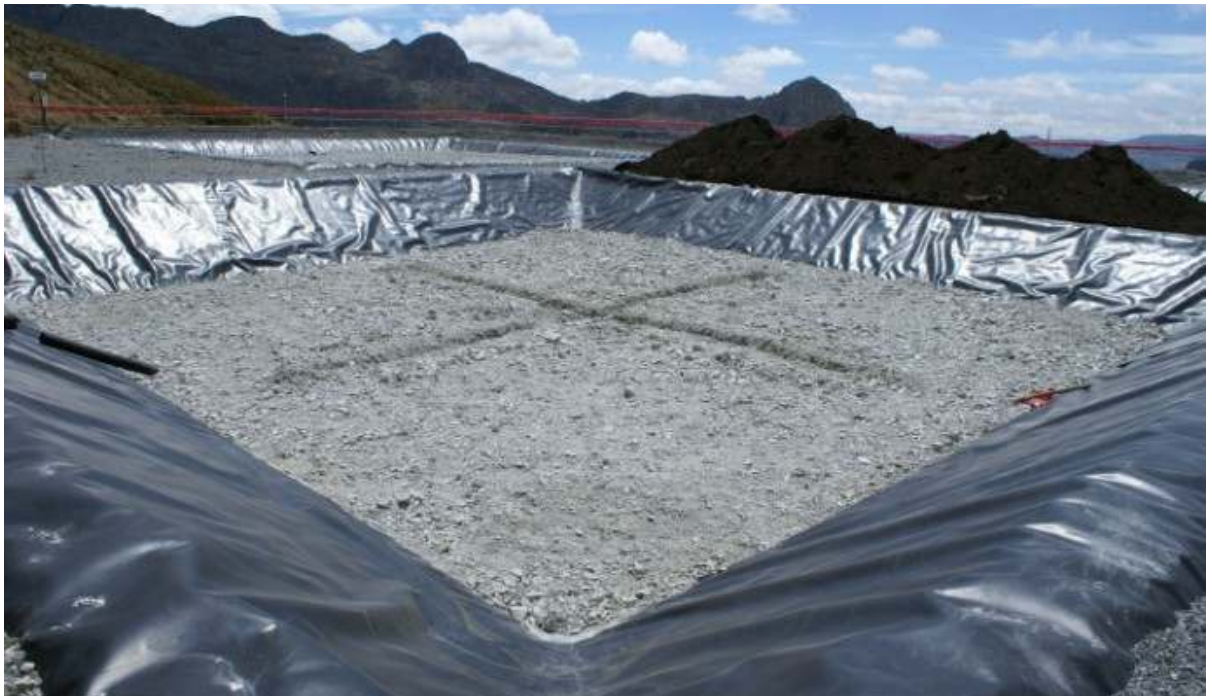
Placing PVC pipes for protecting oxygen sampling tubes.
